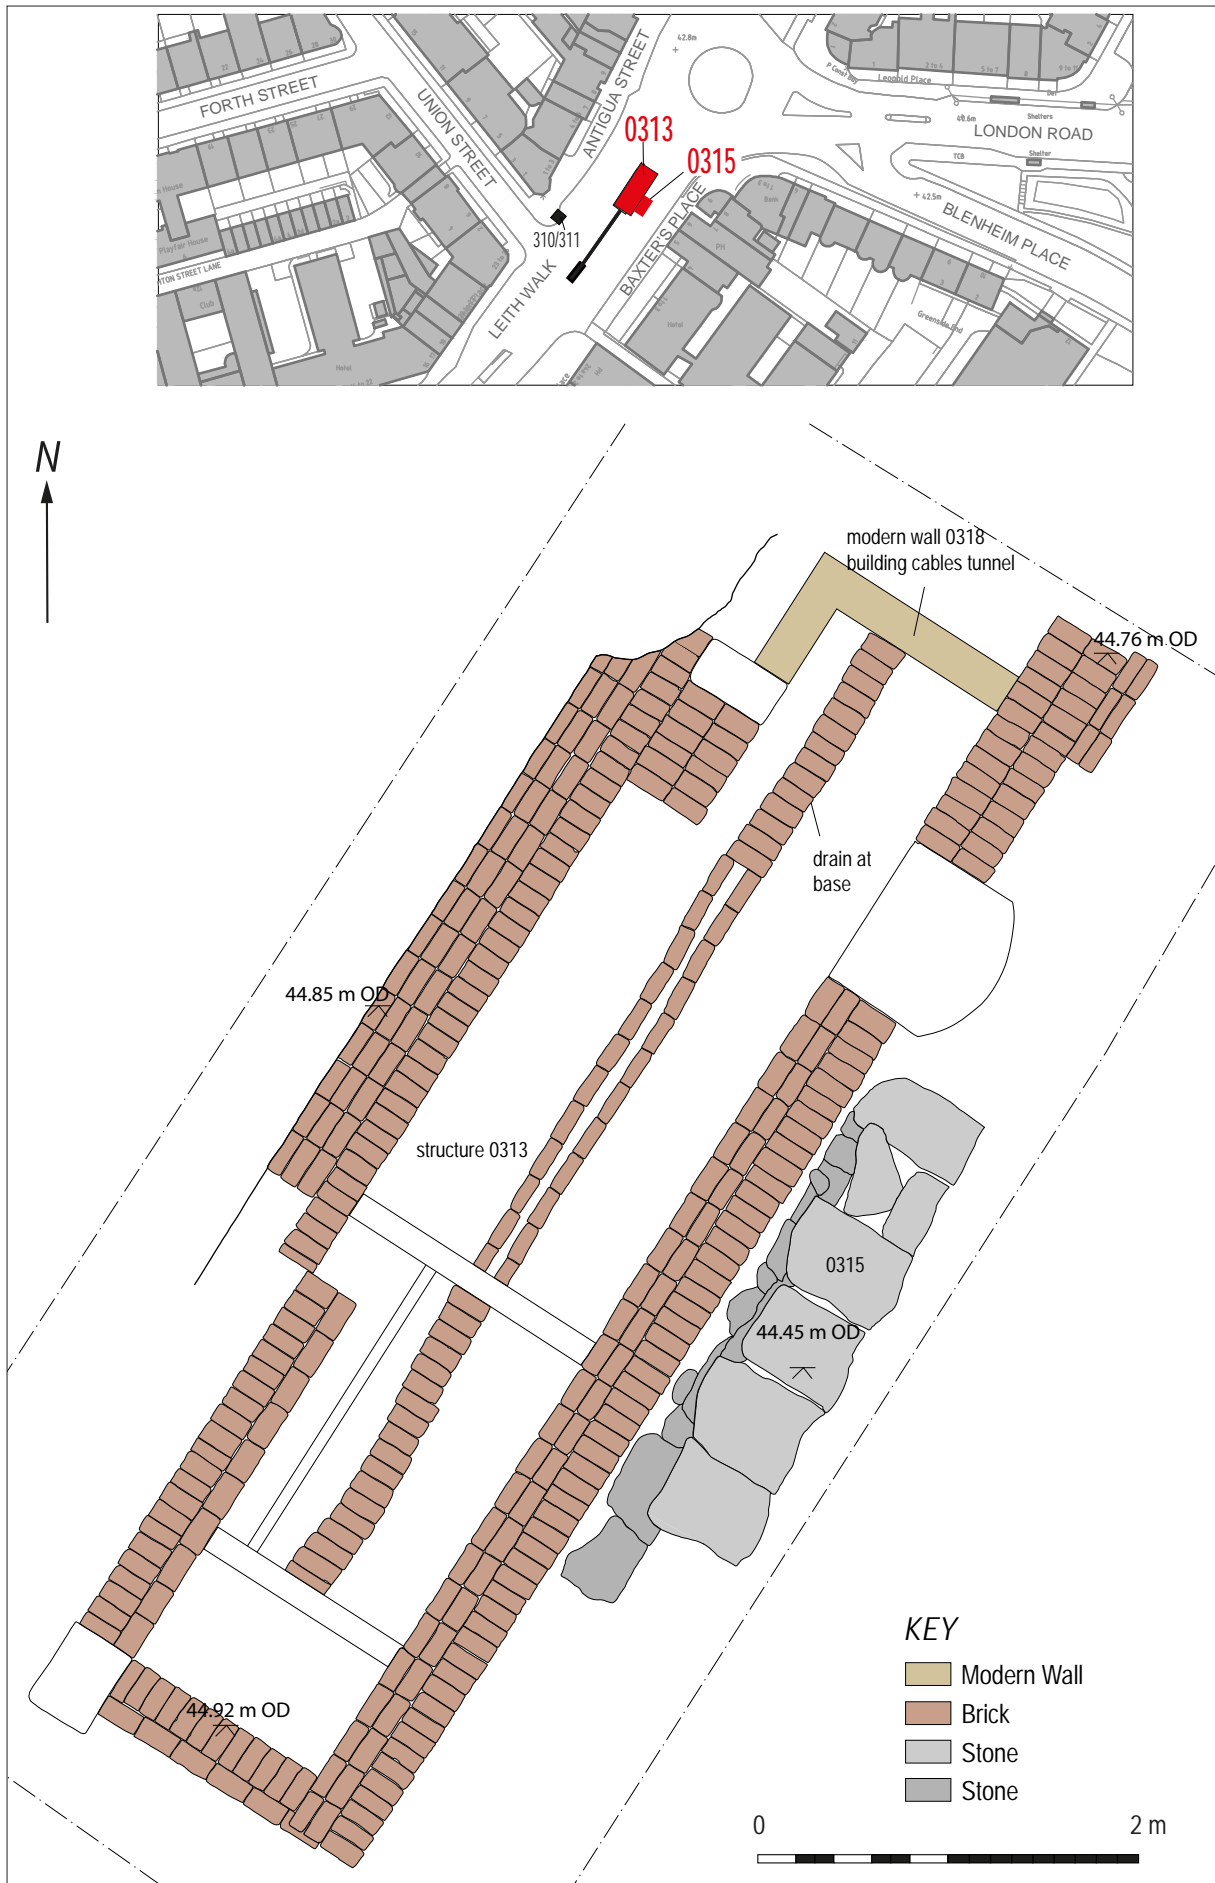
Plan of early Tram chamber 0313 at Antigua Street/Baxter's Place
